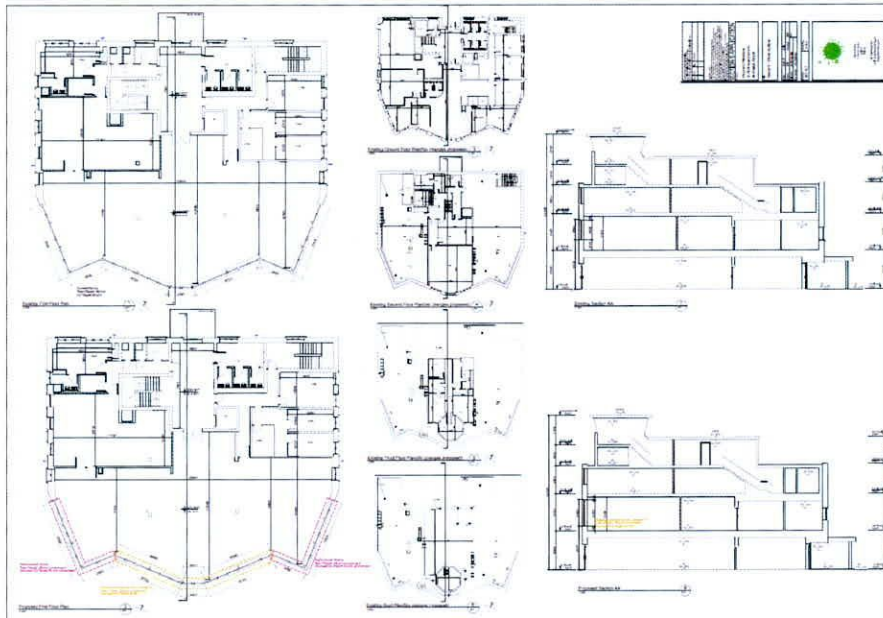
Drawing 937-101 Proposed Floor Plan & Sections (Source: NBK)
